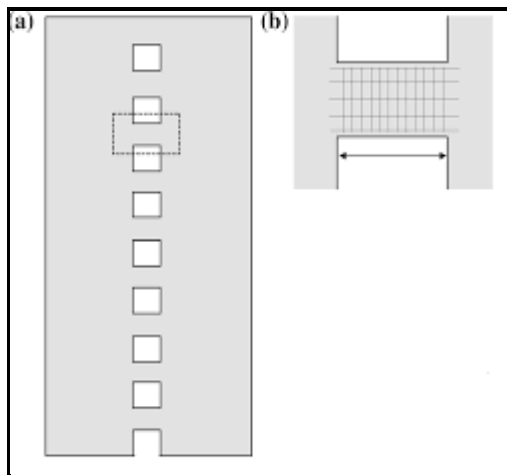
Details of a Beam in Stiffened Coupled Shear Wall System (URL12).
